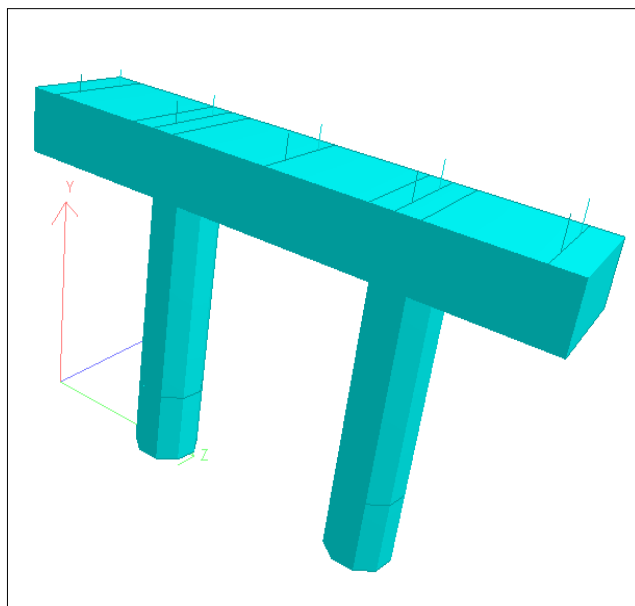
3D Model of Pier (Excluding Pile Cap)
